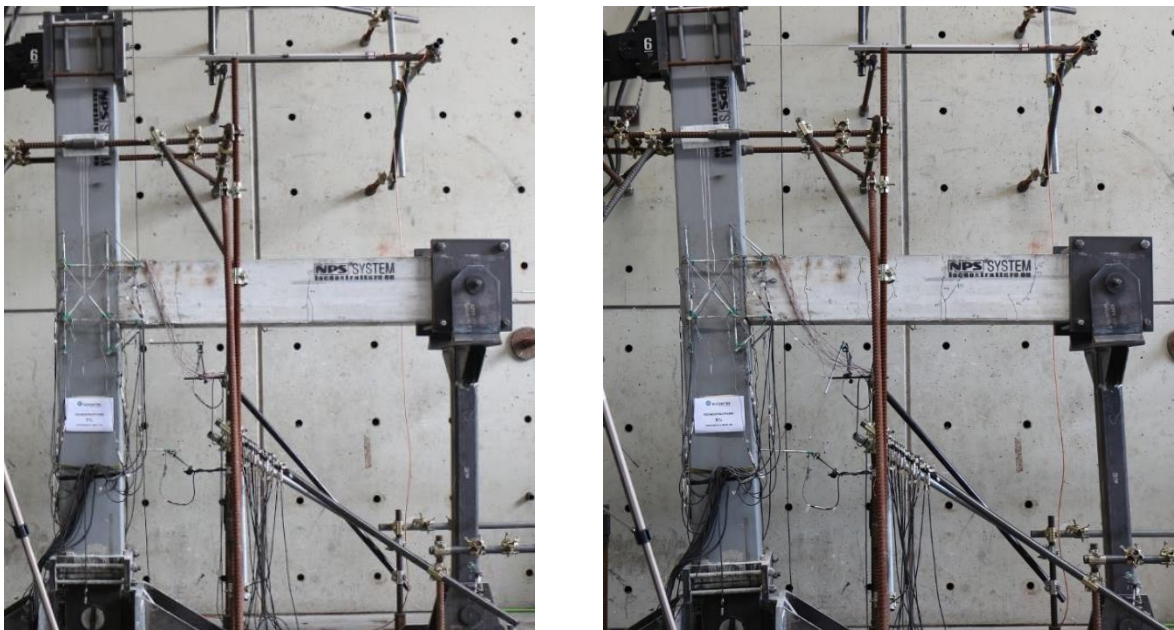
View of Specimen REFe Before (Left) and After (Right) Testing
